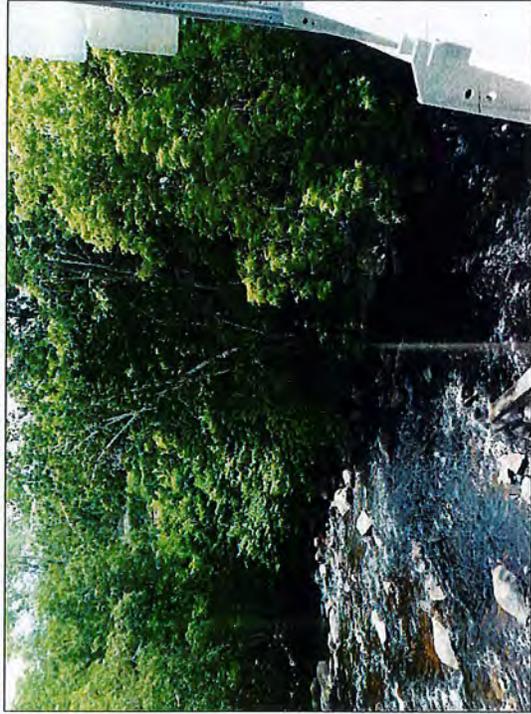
Daniels Street: Vegetation & trees bordering construction site, downstream right bank.
